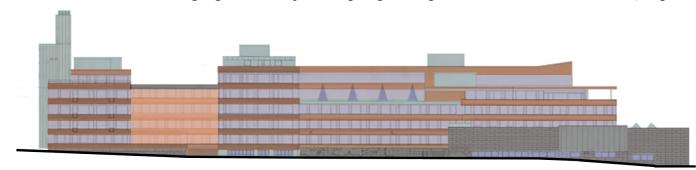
Elevation to the southwest (Alvar Aalto Foundation 1955), altered by authors.
